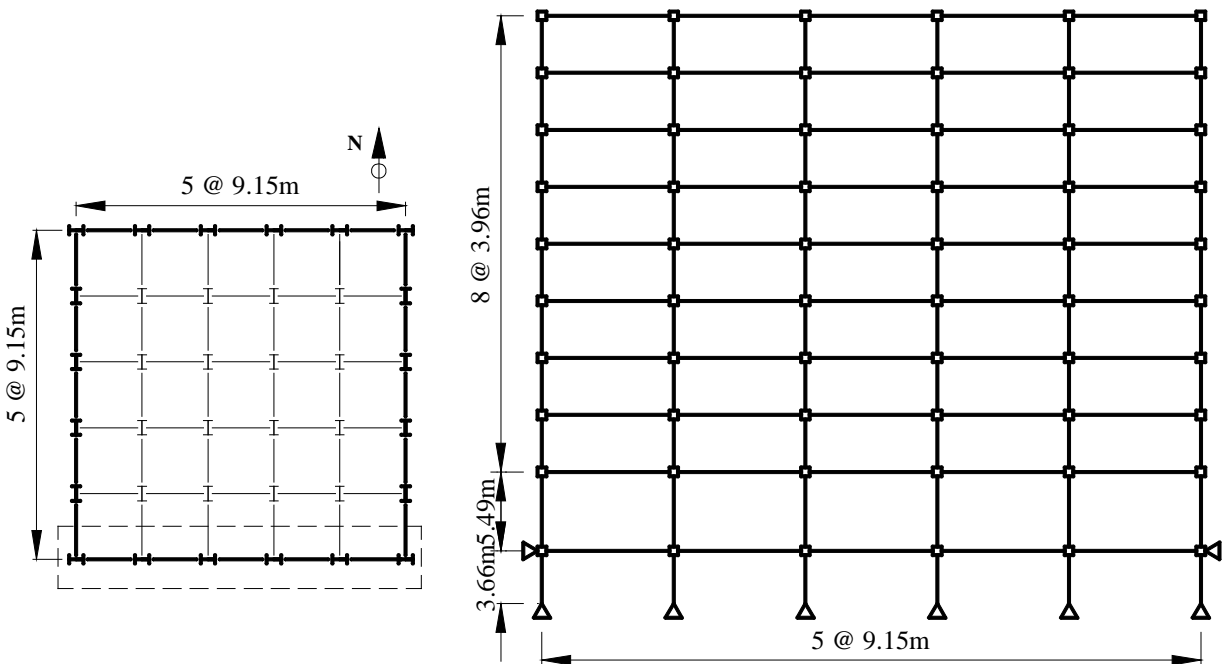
Plan and elevation of nine-story steel special moment resisting frame
